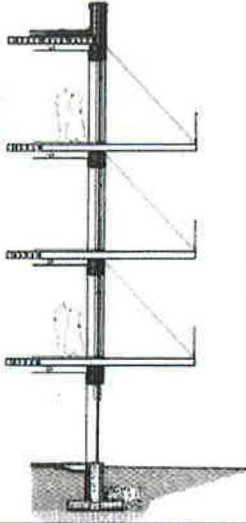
BUILDING ELEVATION - SOUTH (MAIN UNITS)
